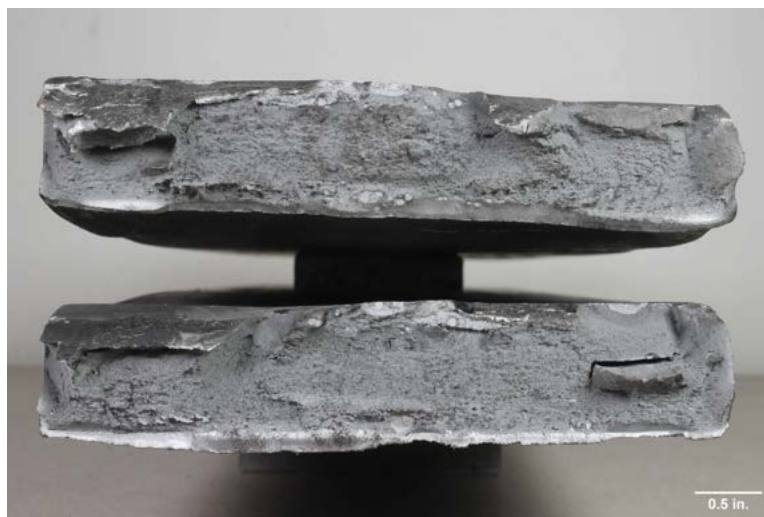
Fracture surfaces of W36-0.25NGTW-T94-R11.02.
